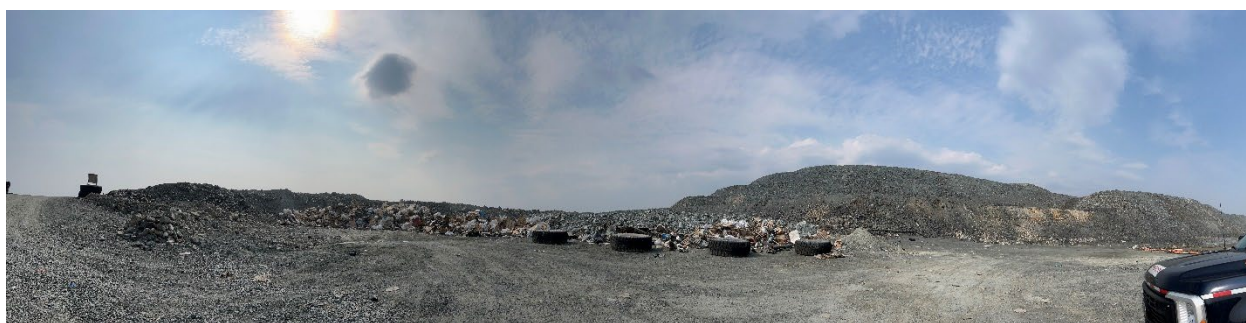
Meadowbank Landfill, it is buried as the waste rock pile increases.
